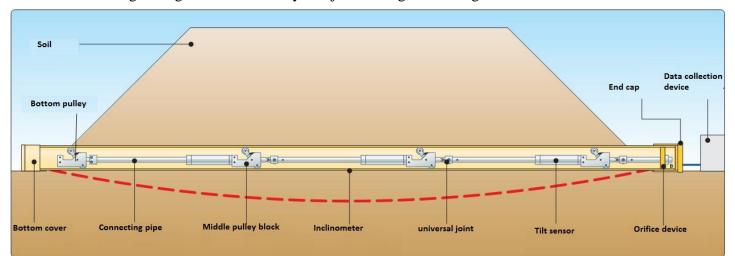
CGEO-IPIA /IPIB /IPID In-Place inclinometer horizontal installation diagram
